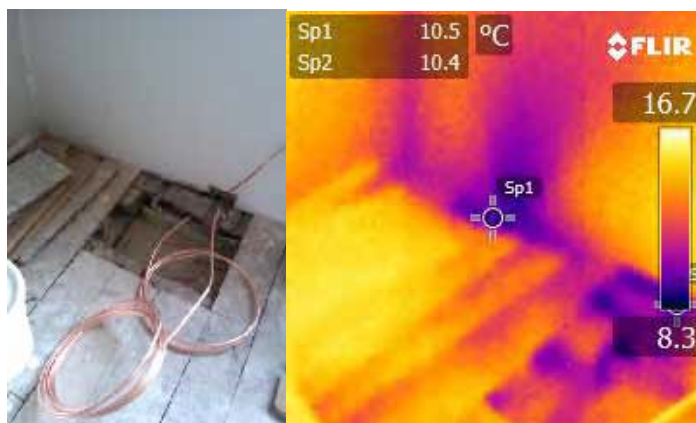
116 Abbeyforegate, Shrewsbury – first floor, south wall, floor wall junction.
